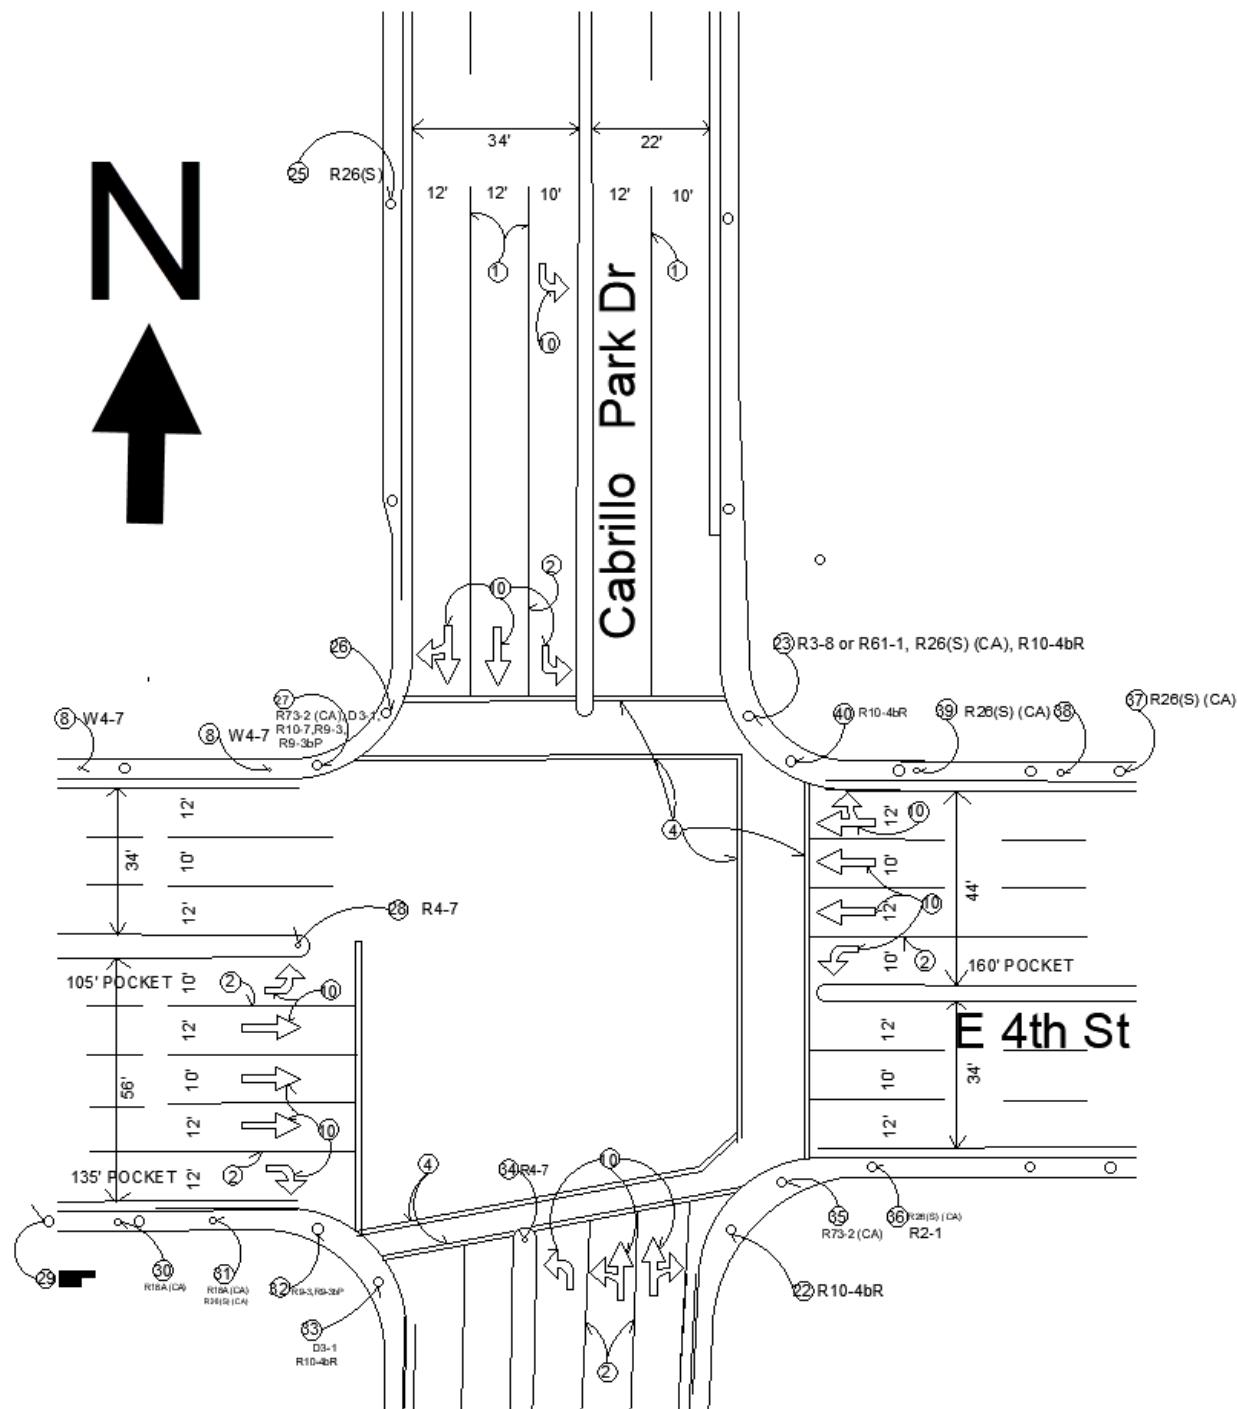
Existing Conditions - Cabrillo Park Drive & E 4th Street
